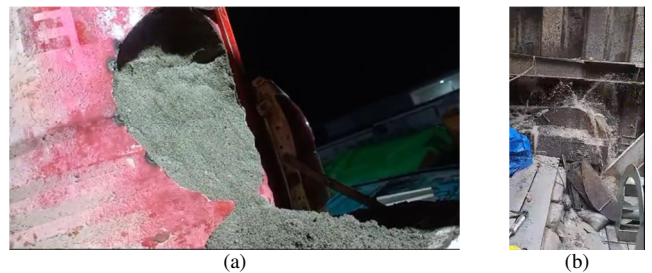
(a) The soil collapse without injection/grouting for modeling, (b) the soil collapse on site without injection/grouting.
